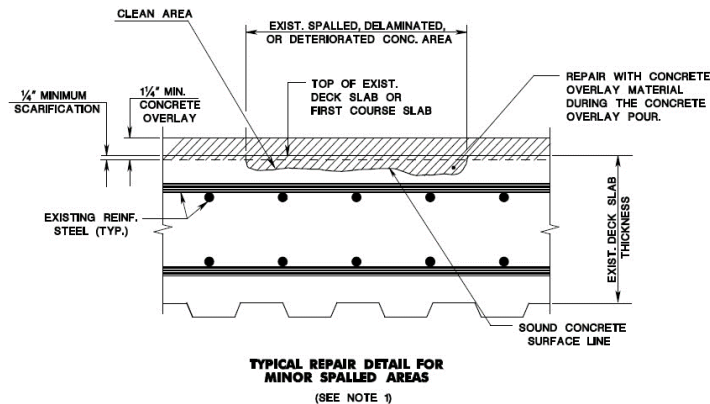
Typical Repair Details for Minor Spalled Areas, NJDOT Bridge Construction Details (BCD) – 551.1 <sup>(3)</sup>
